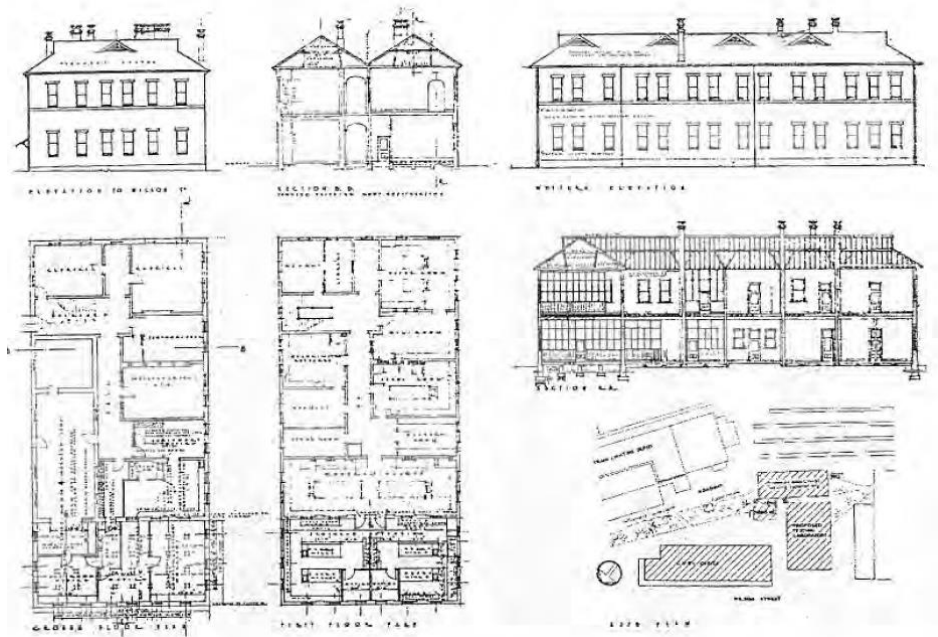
Plan section and elevation of the Testing Laboratory which is constructed immediately to the west of the CME (Source: CME Building CMP 1997)
